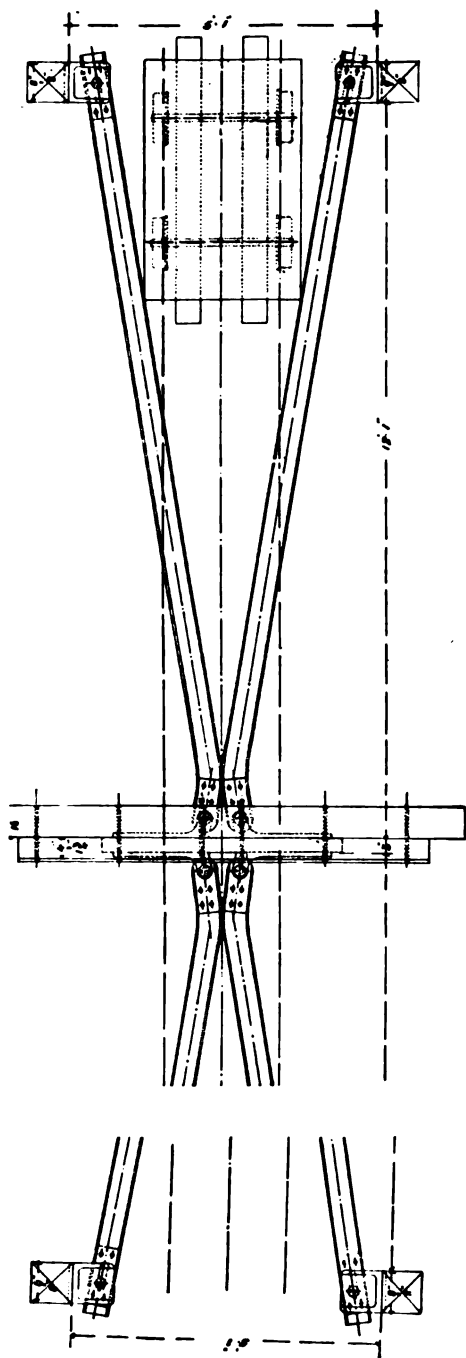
PLAN AND ELEVATION OF AN AUTOMATIC DOOR ON AN ENDLESS-ROPE HAULAGE ROAD, MESSRS. JOHN WOOD & SONS LIMITED, WIGAN.
